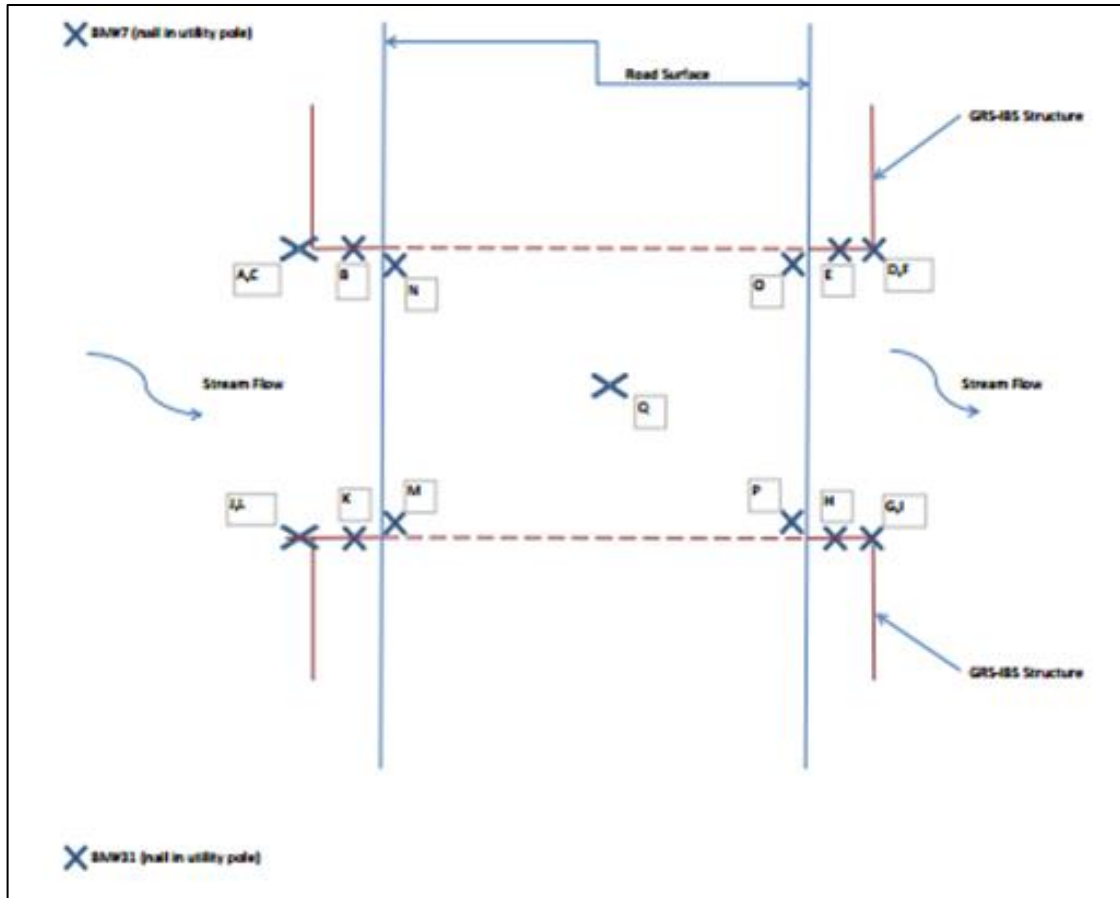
Surveying points for Mount Pleasant Road GRS bridge (Albert 2011)
